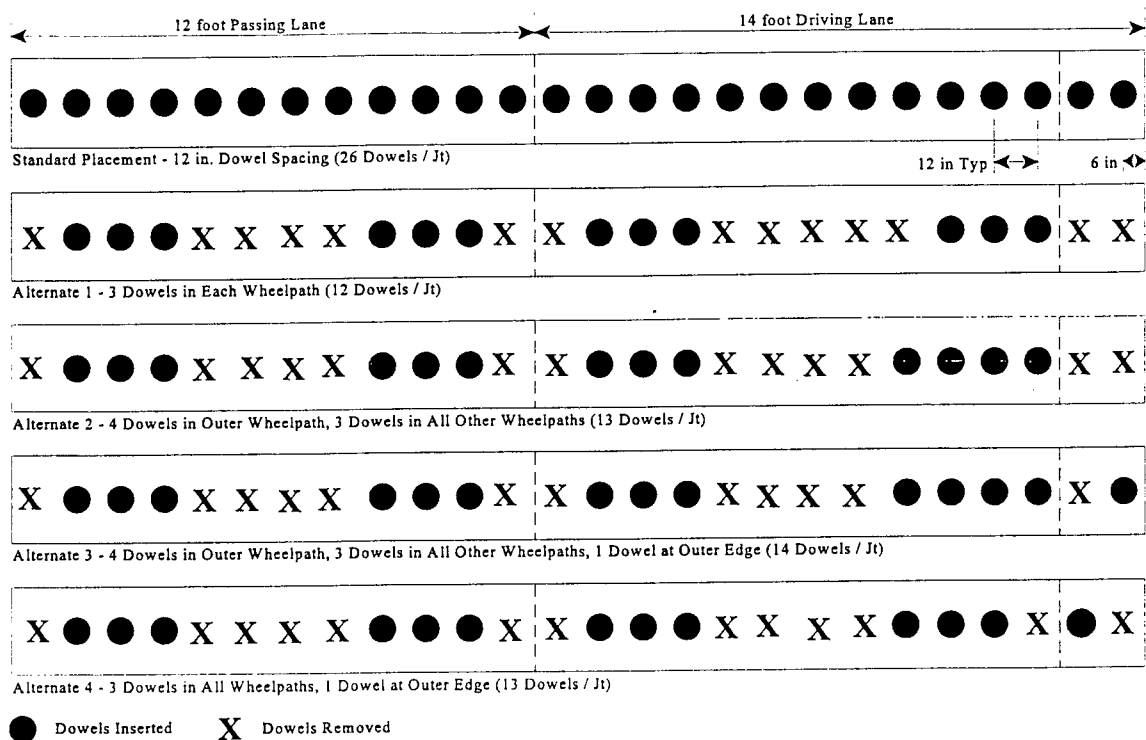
Dowel Bar Placement Alternatives for STH 29 West
